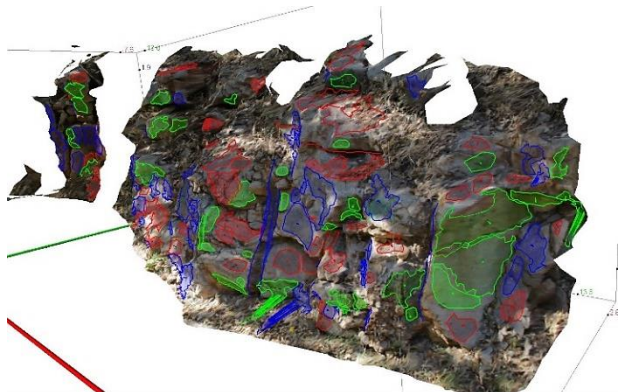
Road slope. Sector 1. 3D reconstruction and planes measured.
